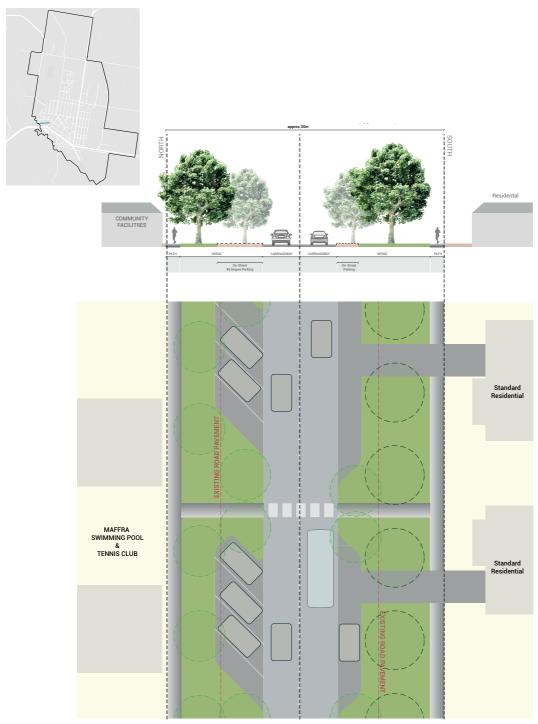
Reduced Pavement Diagram – Duke Street Cross Section – between River St & McMillan St
